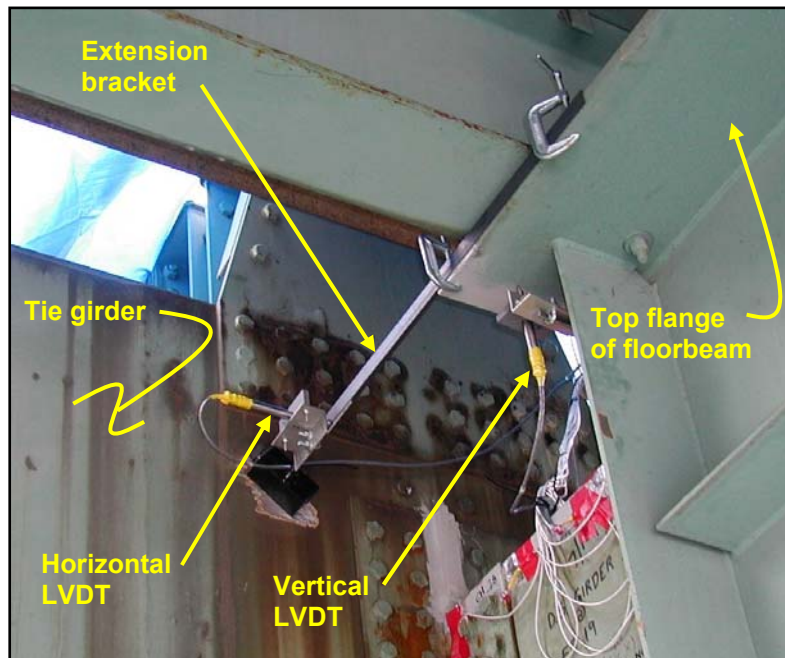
Photograph of horizontal and vertical LVDT's installed at floorbeam connection to tie girder (Vertical LVDT only installed at downstream connection)
